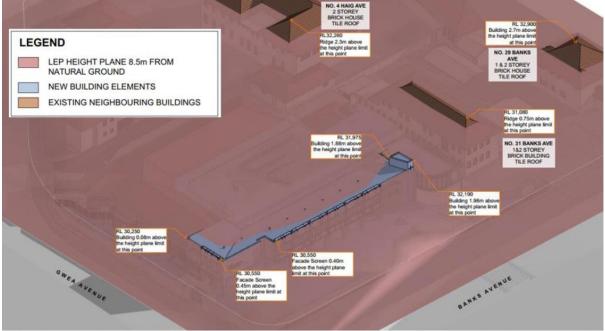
3D Height Plane which illustrates how the neighbouring buildings at 4 Haig Avenue and 29 Banks Avenue and the existing buildings on the subject site exceed the 8.5m building height limit provided by BLEP 2021. Source: Sam Crawford Architects, July 2024.
